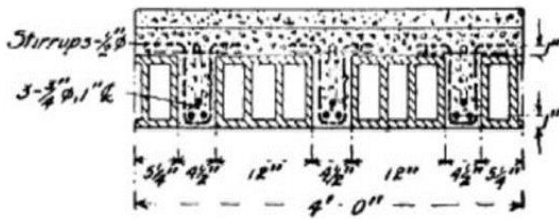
Cross Section of One-way Voided Slab with Hollow Tiles (Source: Mota, 2013)
